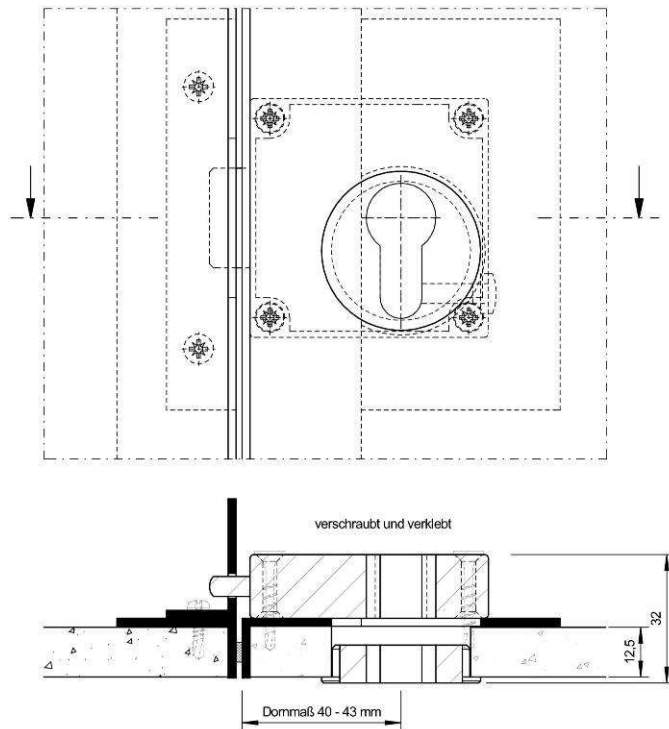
Drawing - surface mounted latch-bolt lock in panel with 12.5 mm GKBI
